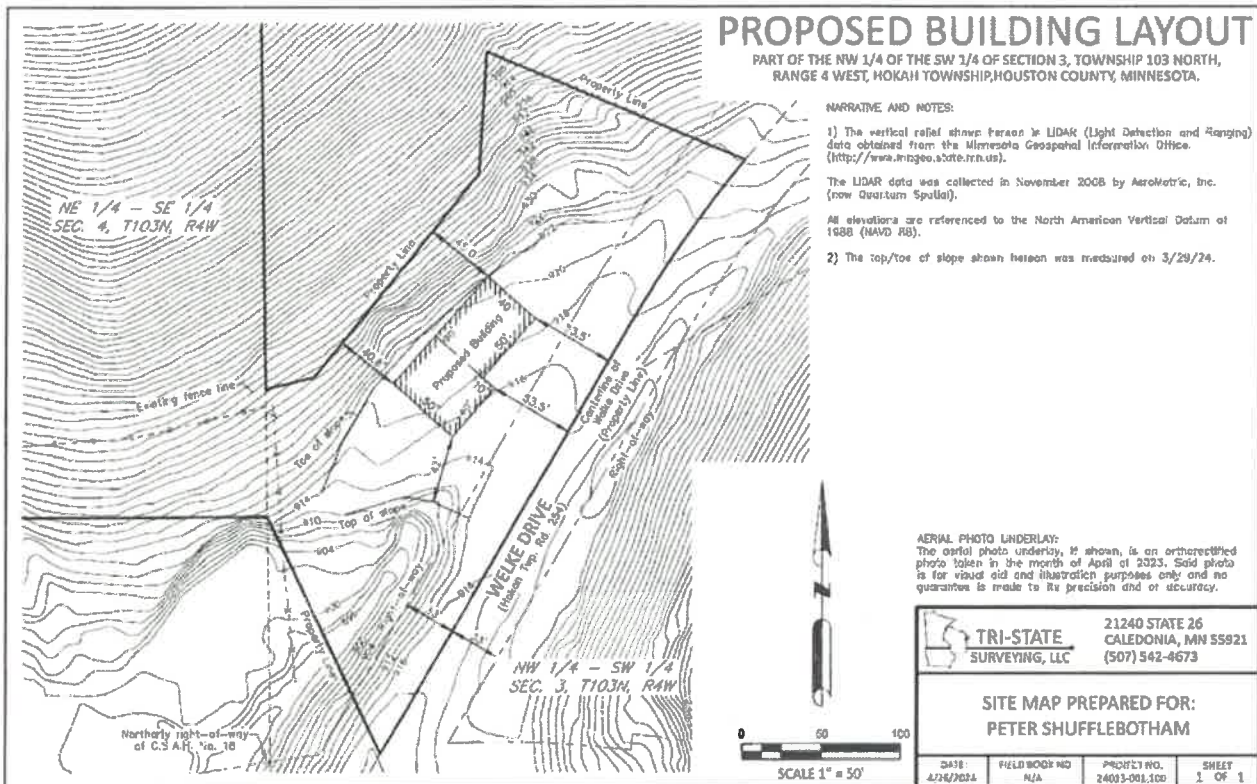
Setbacks for proposed Dwelling (Revised Plan View)
